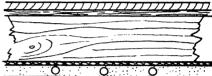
Ceiling construction in a concrete building. (Chase Brass & Copper Co., Inc.)
